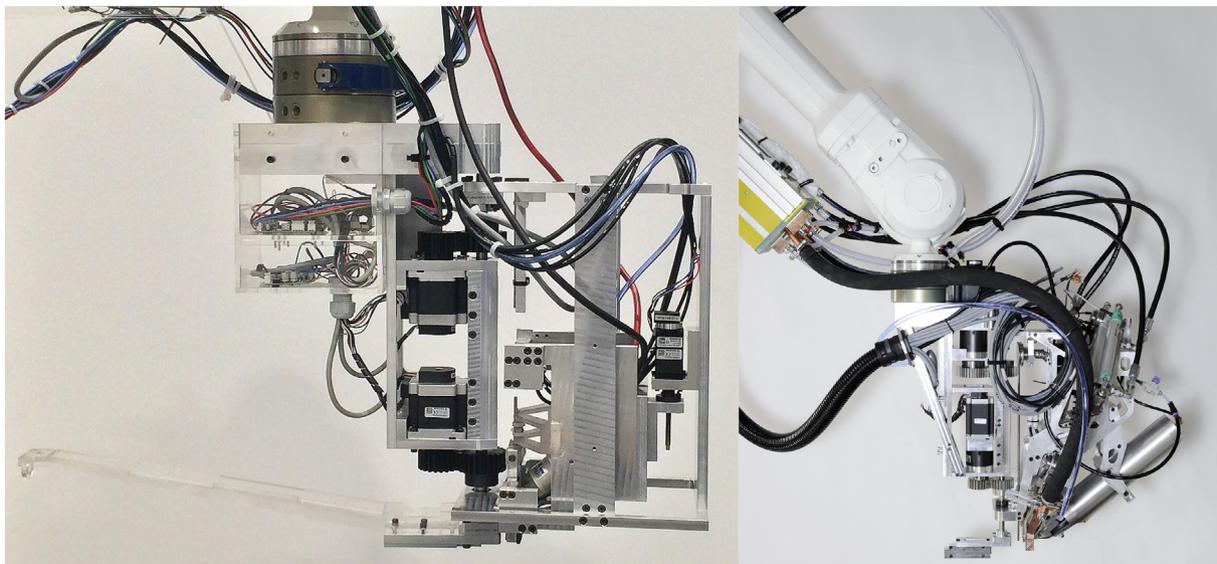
Two versions of the mesh mould tool head. (a) An earlier electrically actuated version for steel diameters up to 2 mm. (b) Improved head with a hydraulic welding clamp and pneumatic cutting unit. This version is able to process reinforcement steel of up to 6 mm in diameter.
